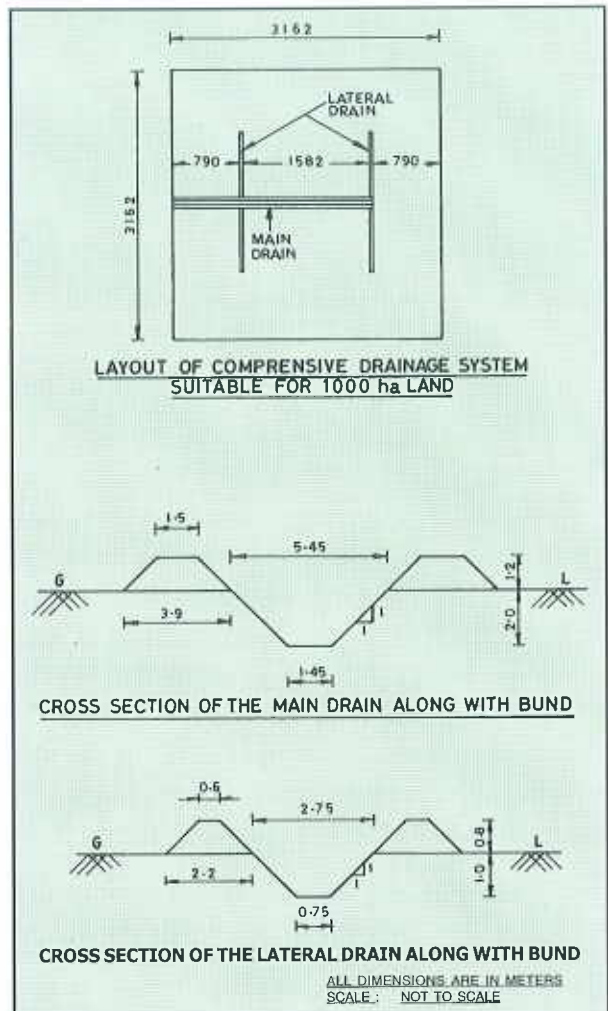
Layout and cross section of main and lateral drain of a comprehensive drainage system for 1000 ha
